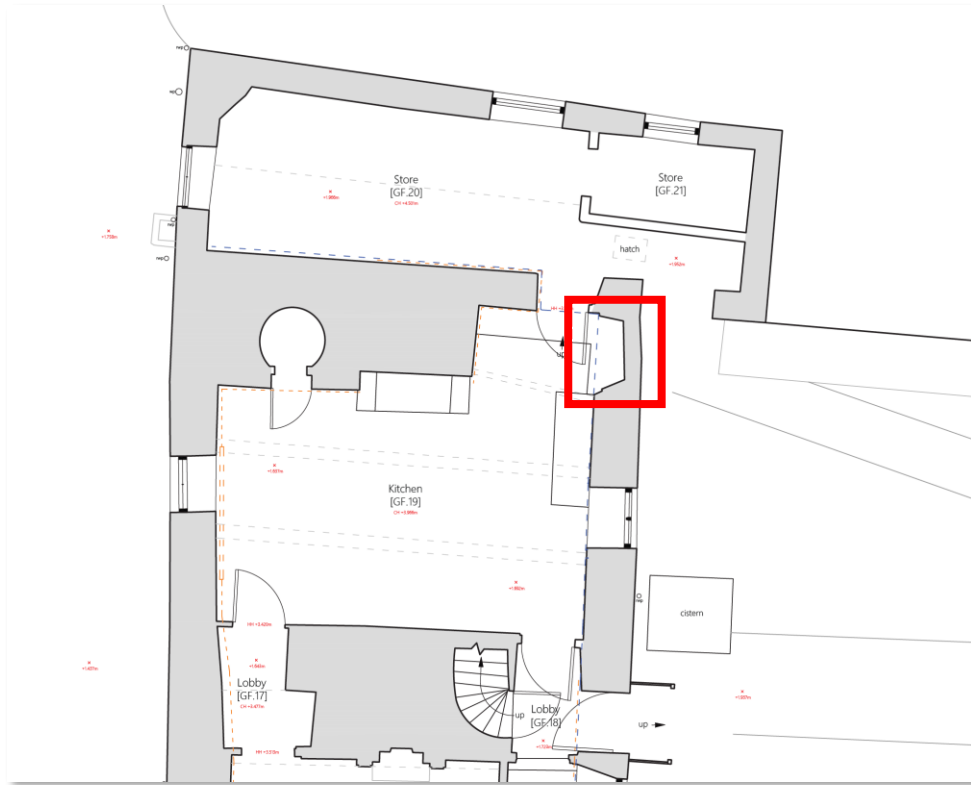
Location of works – Ground Floor (Fig. 11).
